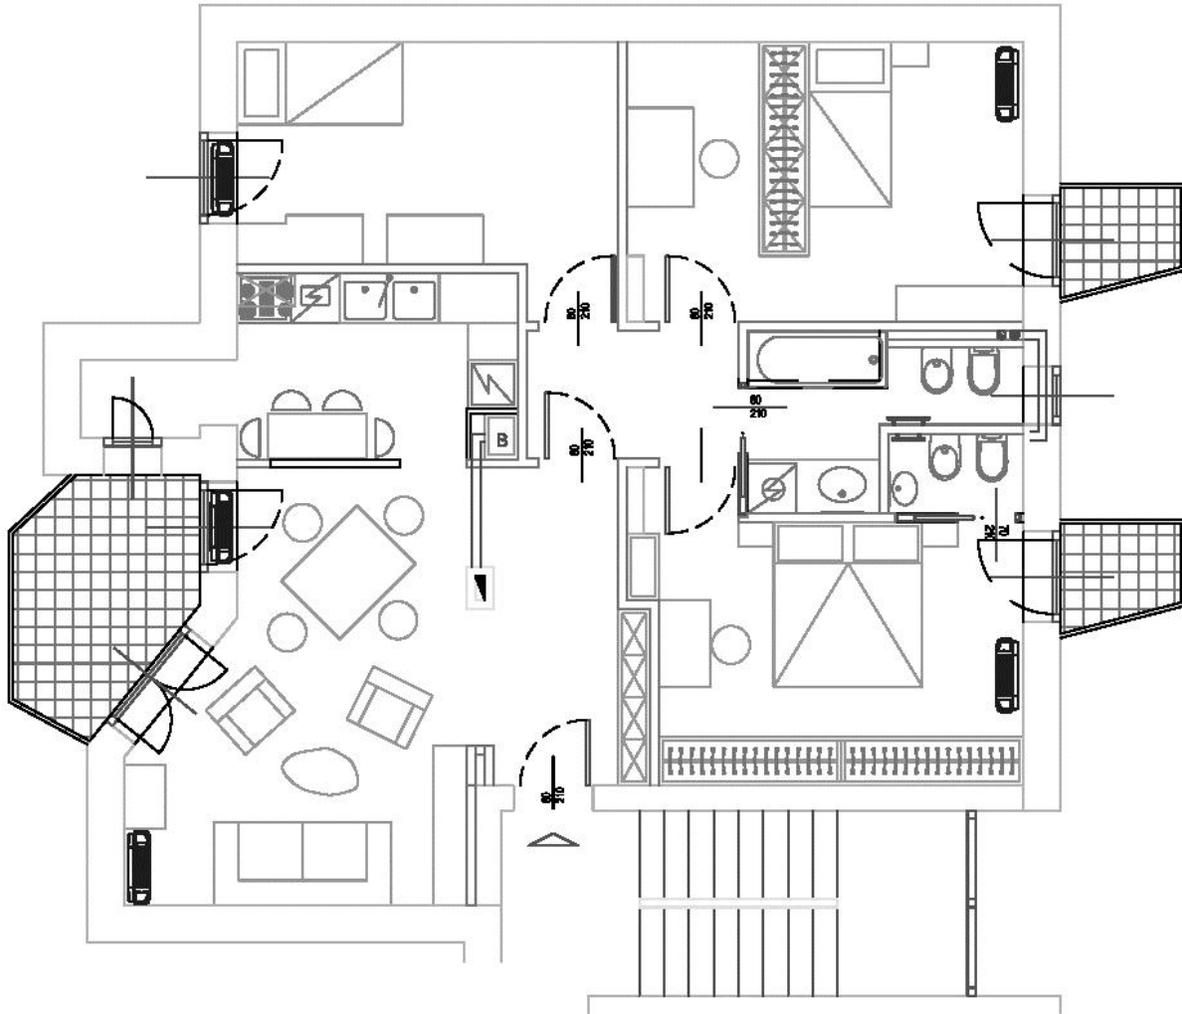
Flat layout – Source: ECD archive www.ecd.it (architectural design Studio BP)
